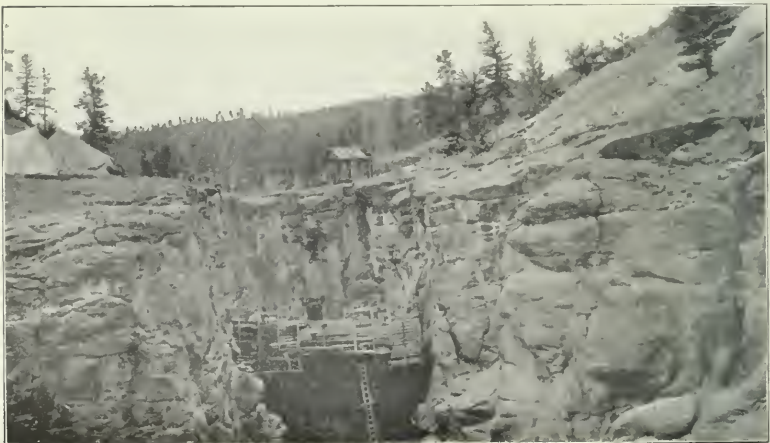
TERRACE DAM. CONCRETE CORE-WALL UNDER CONSTRUCTION.
